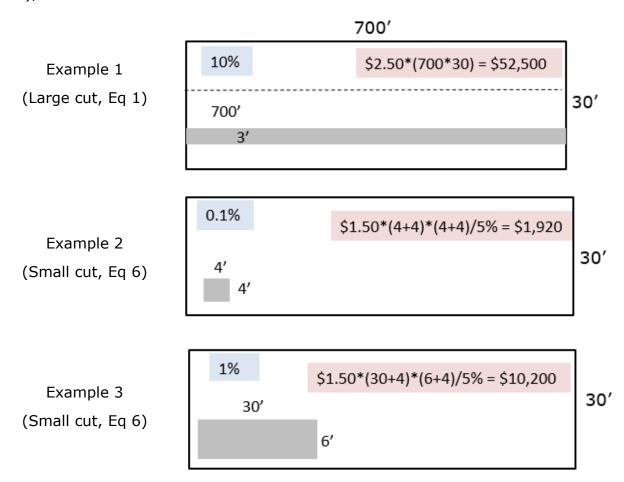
Examples of Fee Implementation for Typical 700'x30' Residential Street with Pavement Age < 10 years
